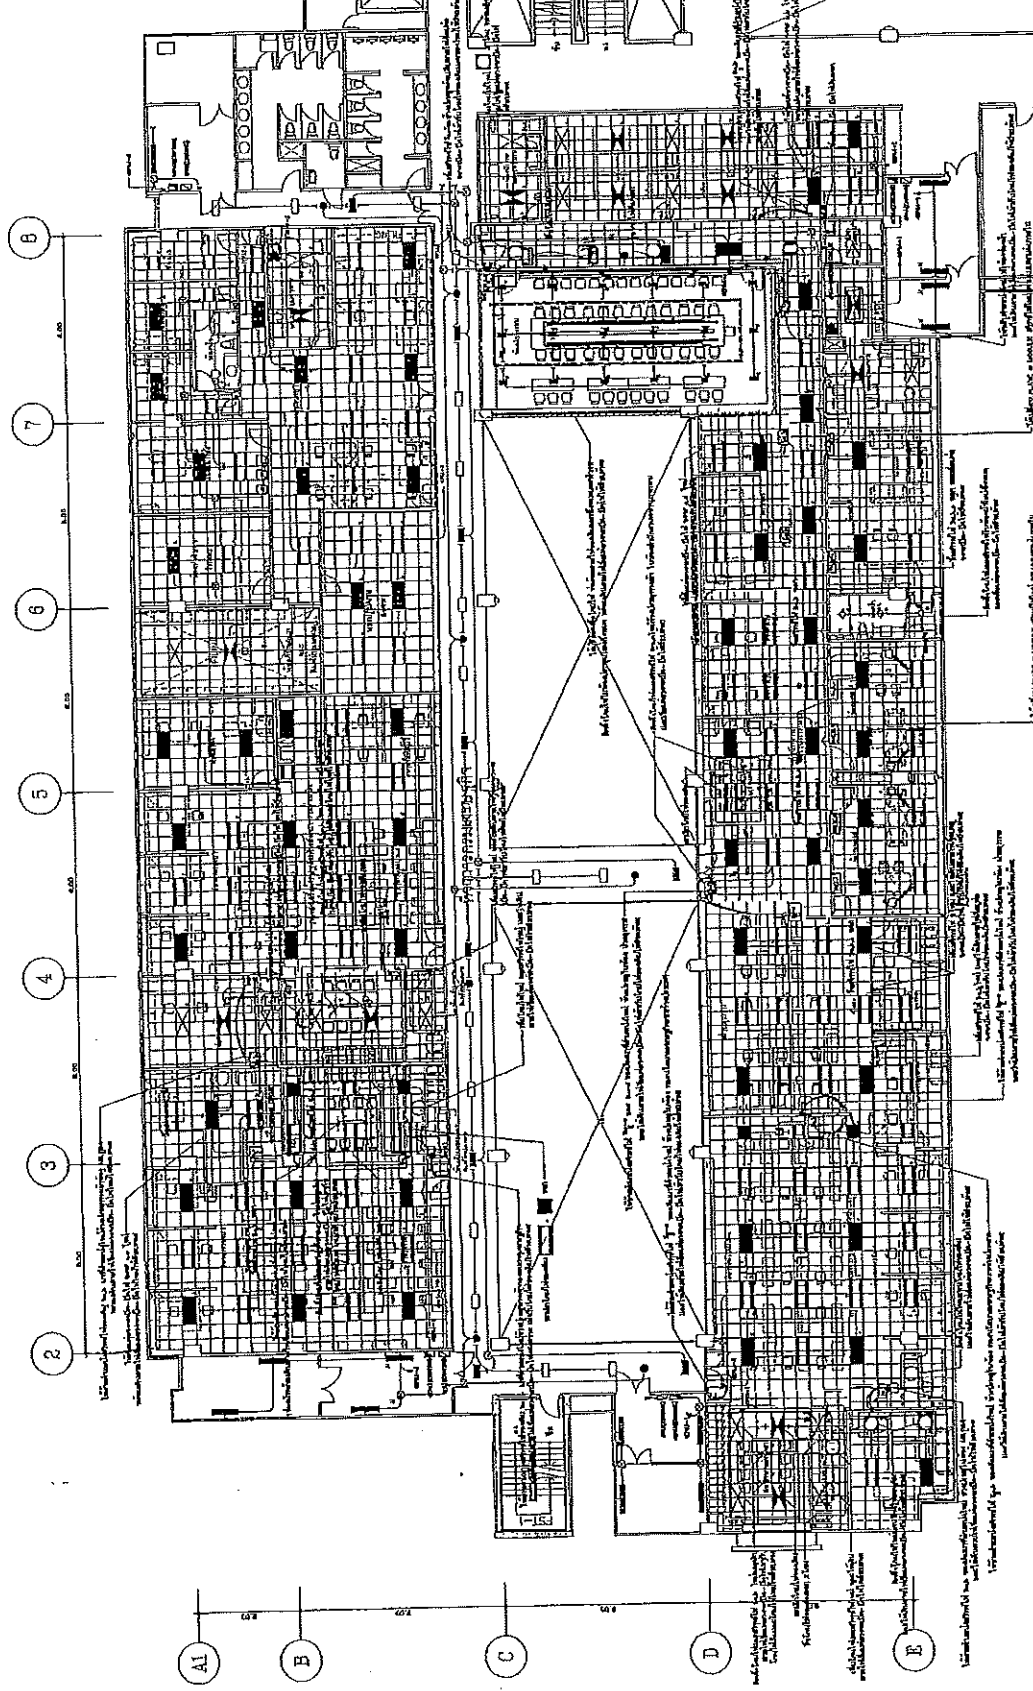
DETAIL FLUSH FLOOR CABLE TRUNKING AND CONDUIT INSTALLED FOR FURNITURE
